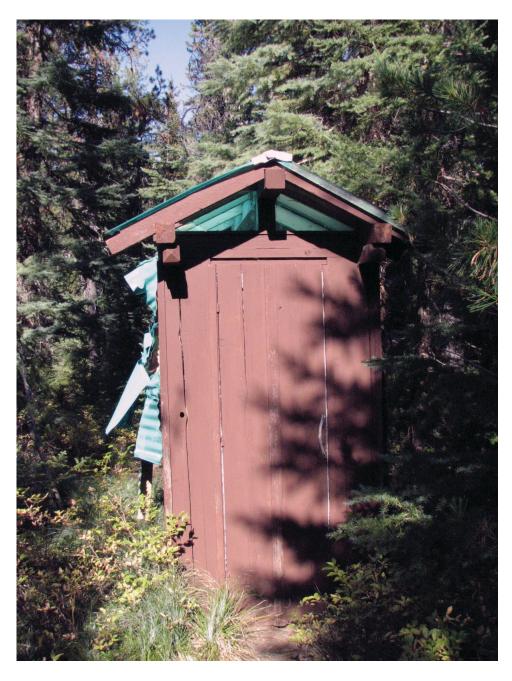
Camp toilet, constructed from the 1945 Recreation Plans Handbook. This one has corrugated plastic roofing, damaged from the winter. Both shingle and plastic roofing are appropriate, and were indicated in original construction plans.
